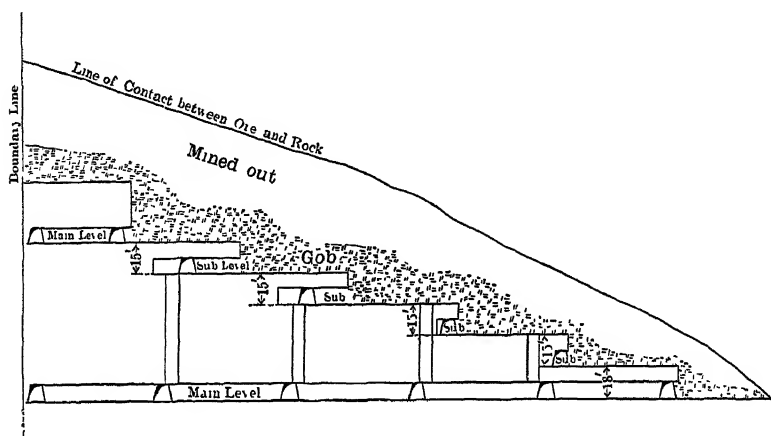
LONGITUDINAL SECTION OF MINING IN 300-FT. BLOCKS OR SECTIONS. VERTICAL SCALE EXAGGERATED.
